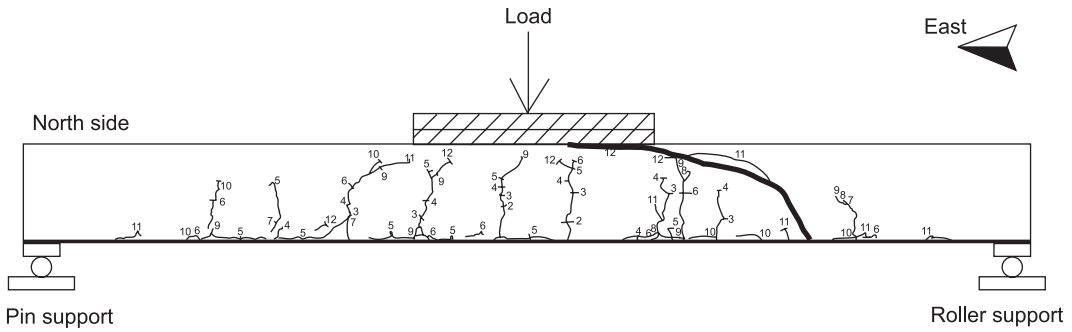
Crack pattern of FRP deck slab under concentrated load [20]
